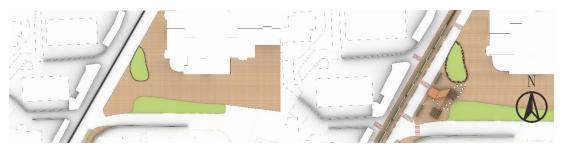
Plan Before and After the Design (Source: Drawn by the author)
